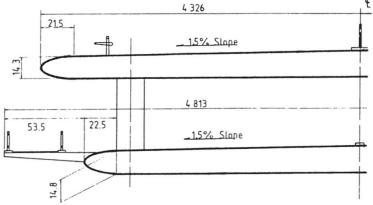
General view of section model of Vierendeel-type (unit in mm)
